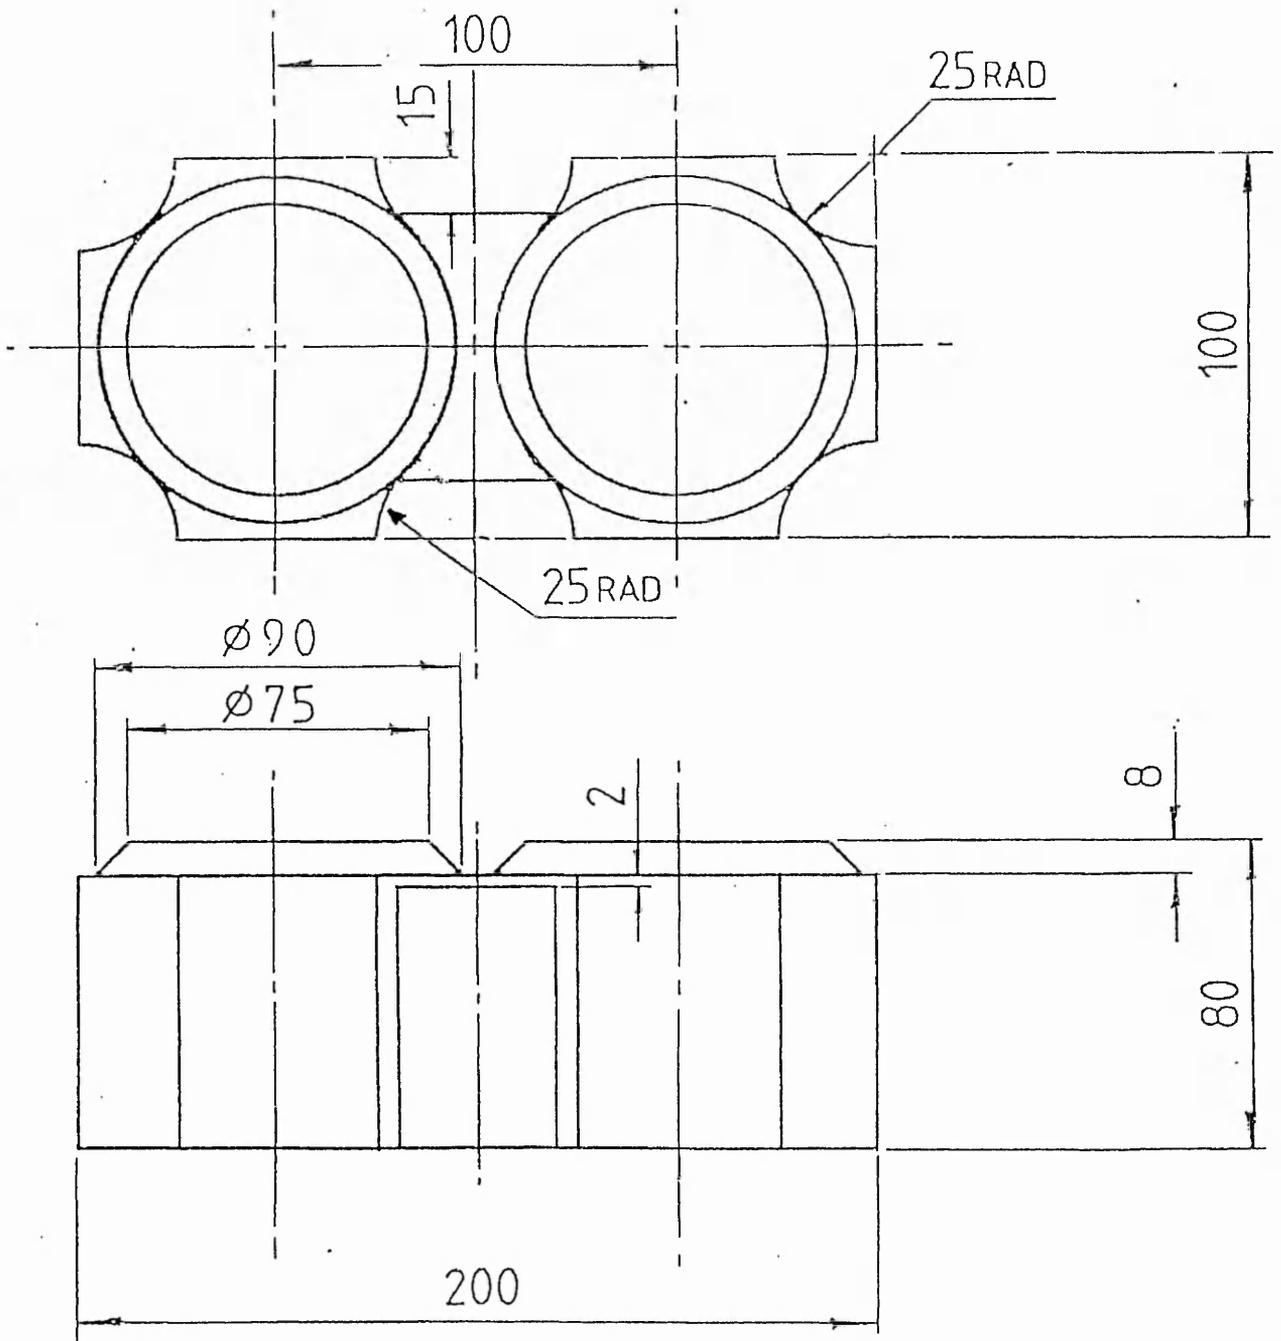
Design of concrete block used for surfacing the permeable pavement.
